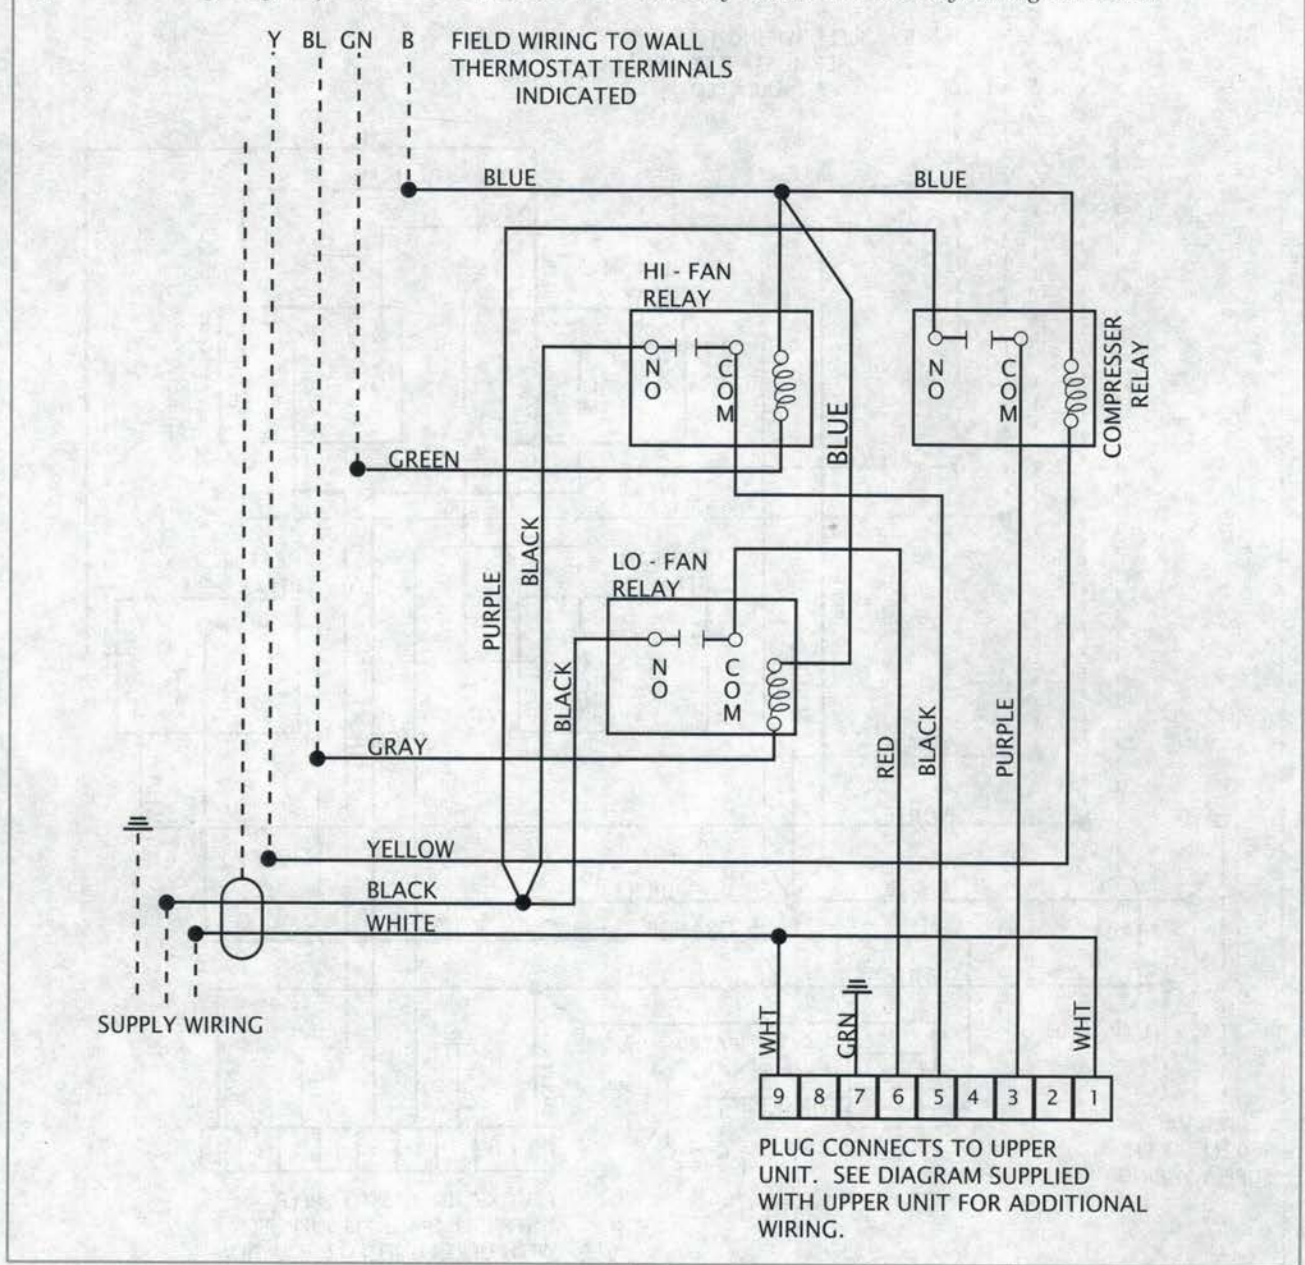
Wiring Diagram for 7330A726 and 8330-725 Heat/Cool Remote Free Delivery Ceiling Assemblies
